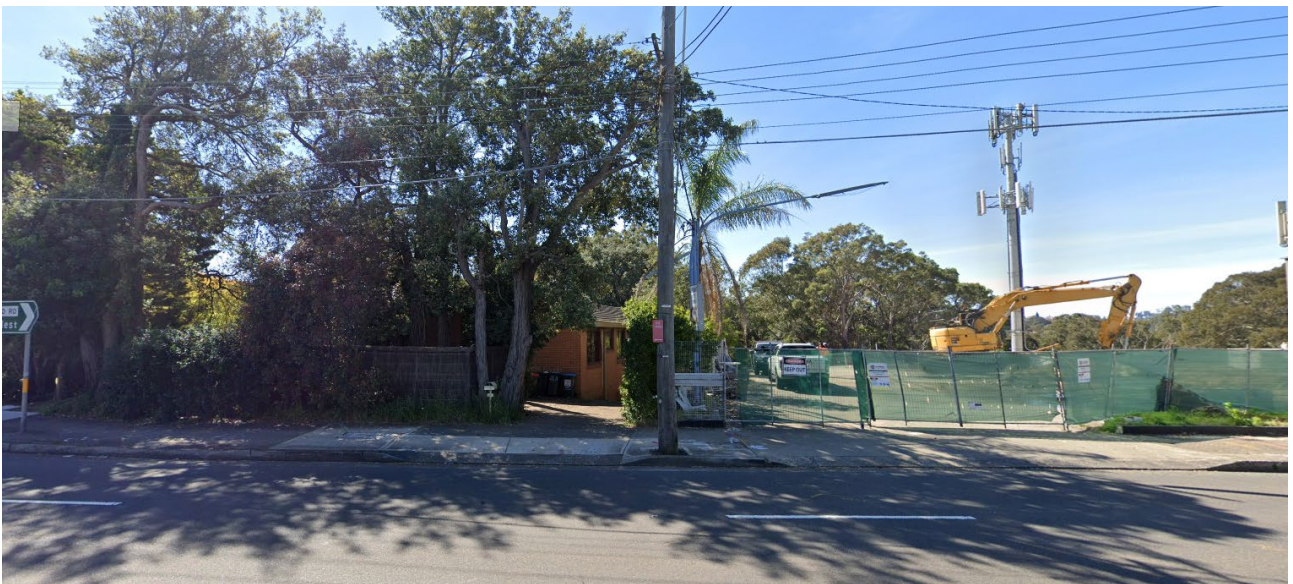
274 and 274A Northwood Road and existing Telstra tower on the site
